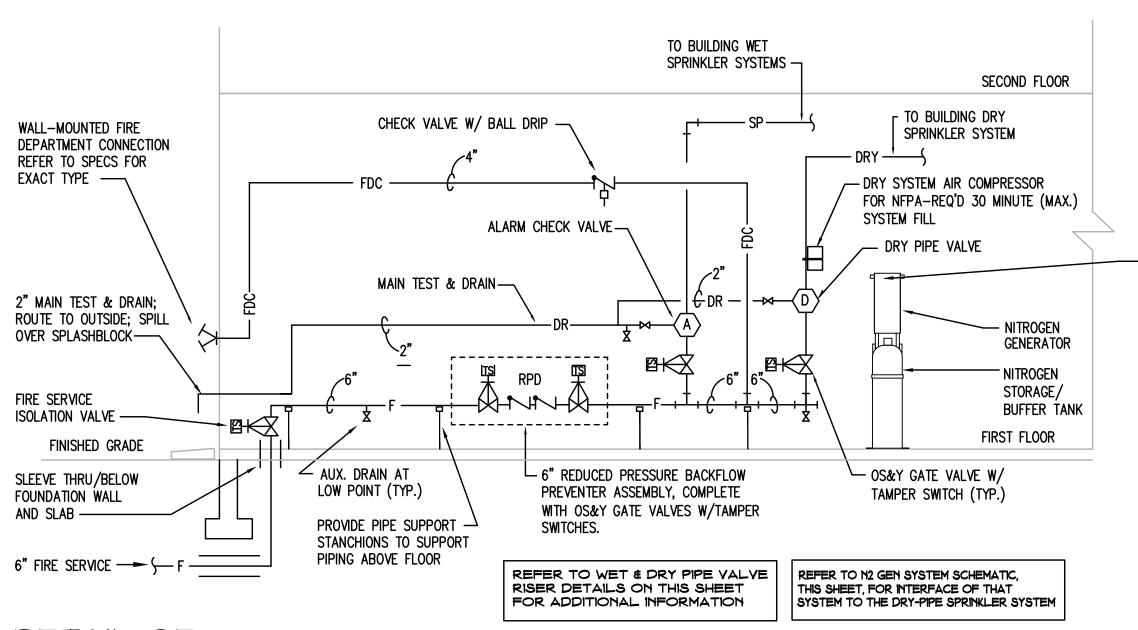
DETAIL OF DRY PIPE RISER AND DRY PIPE VALVE ASSEMBLY SCALE: NONE
